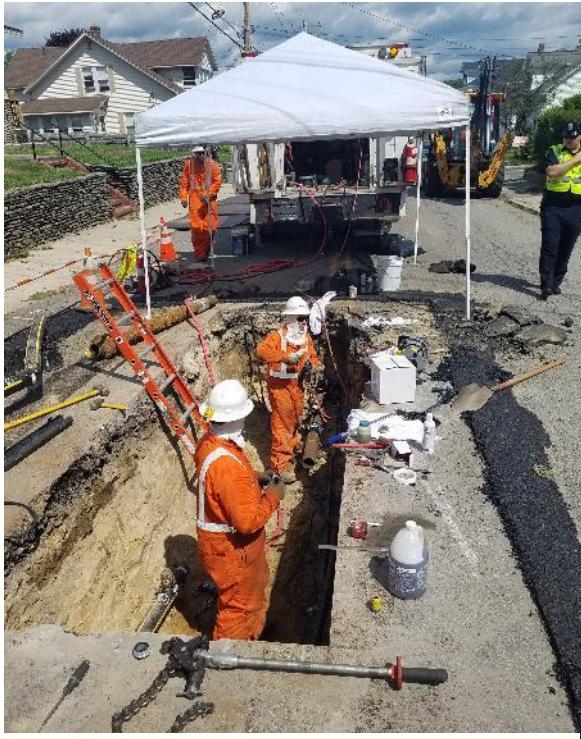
UNITIL/NEUCO crews connecting mains at Clarendon Street and Pratt Road
